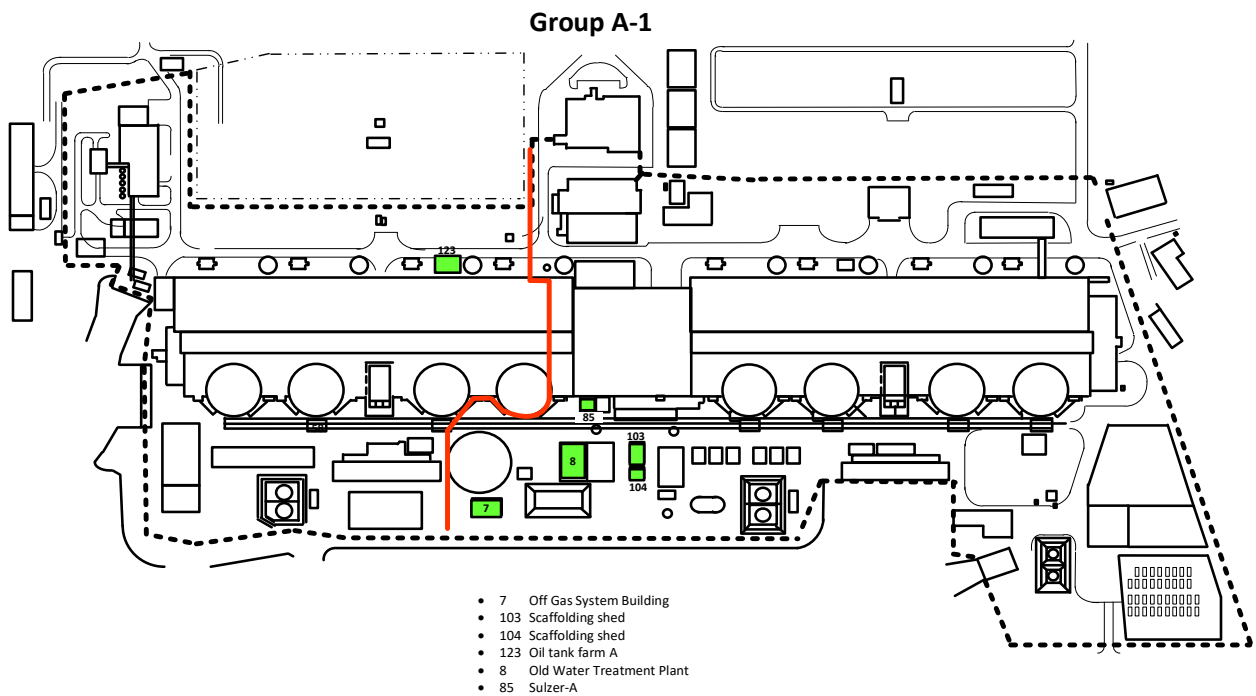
Planning Envelope A – Group A-1 Out Buildings Highlighted in Green
